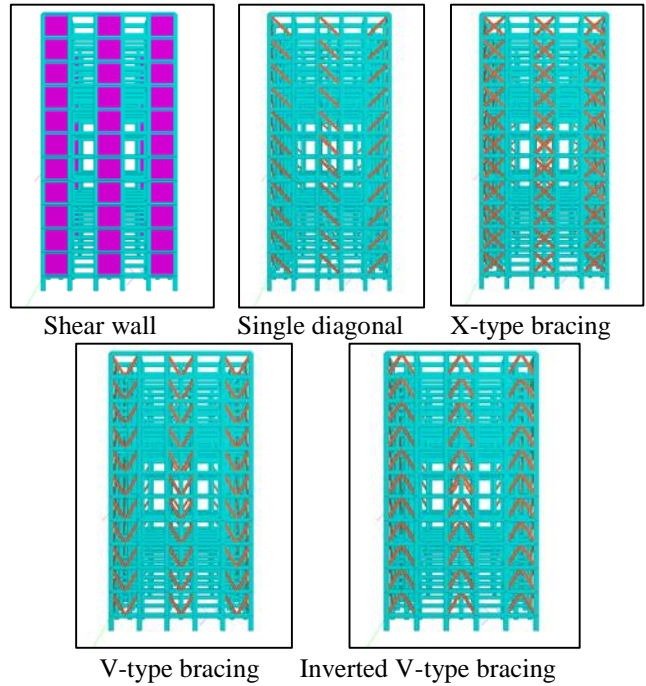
Elevation of G+10 storey building using different types of bracing pattern & shear wall used in corner & middle position.
